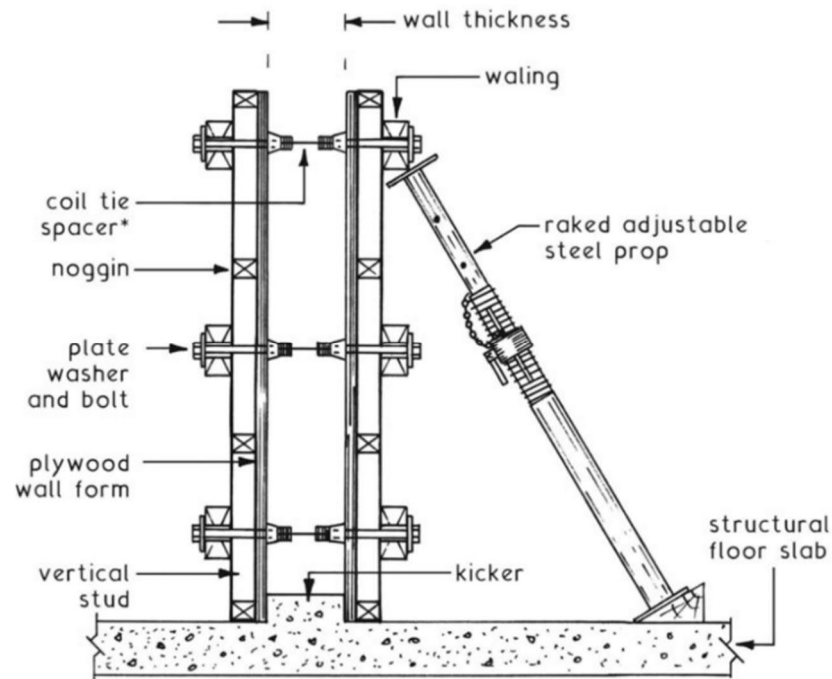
Wall formwork principles (Chudley & Greeno, 2014, p. 615)
